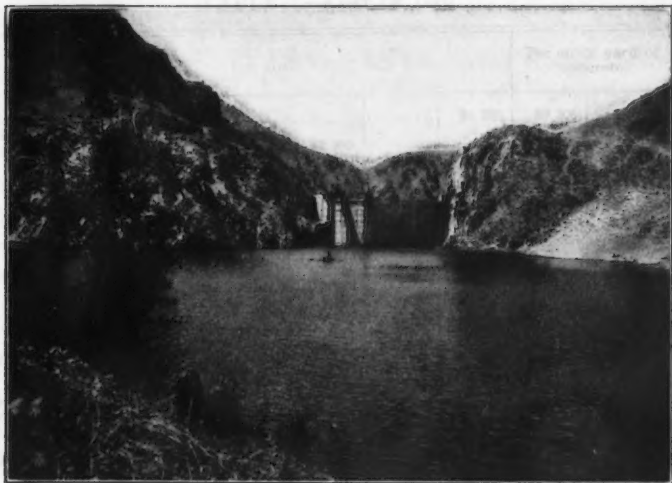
FRONT OF DAM, WITH 53 FEET OF WATER.
